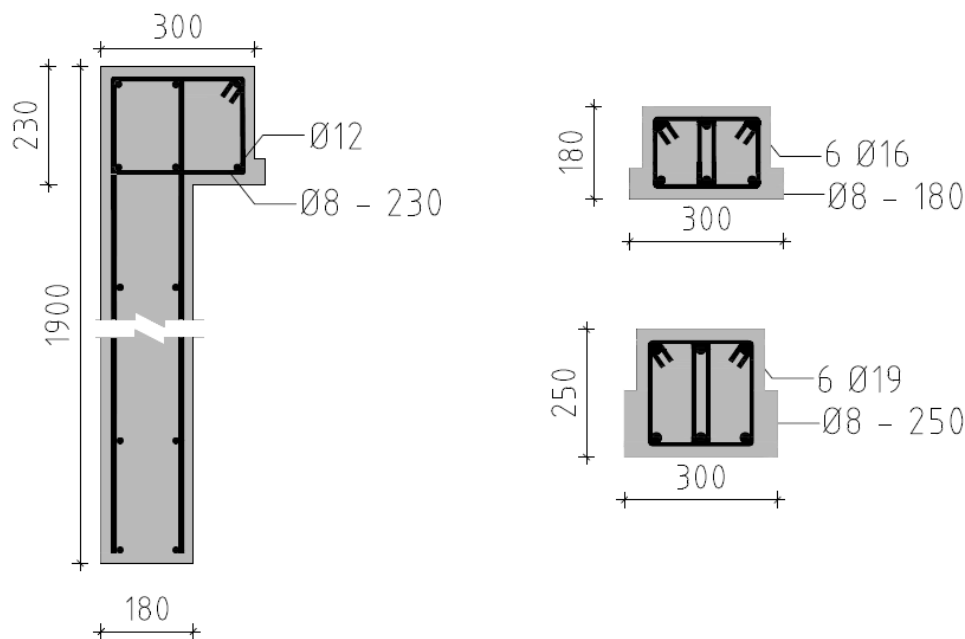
The reinforcement of column B, C and D, Column B to left and C to right above D.
